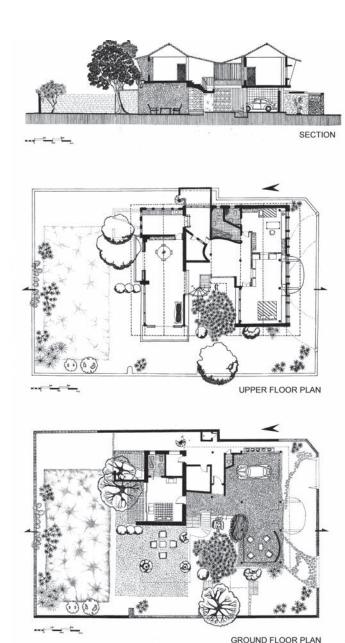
Pieris House, plans and section. © C. Anjalendran Studio.
